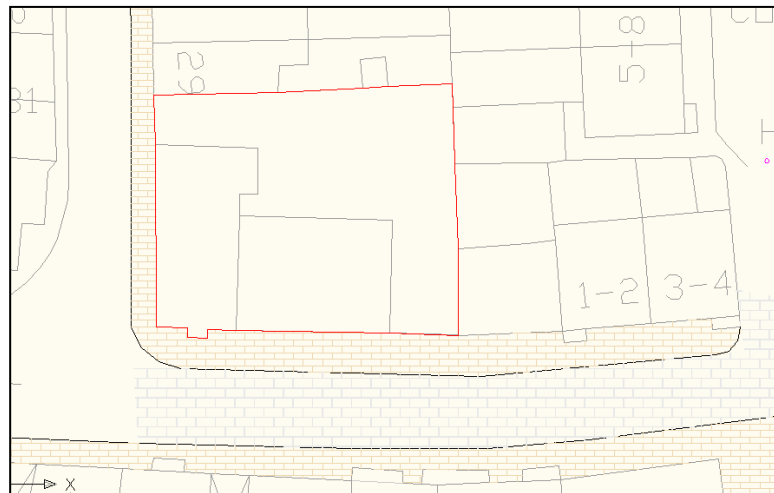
Existing layout of buildings with proposed public realm improvements on Castle Street
